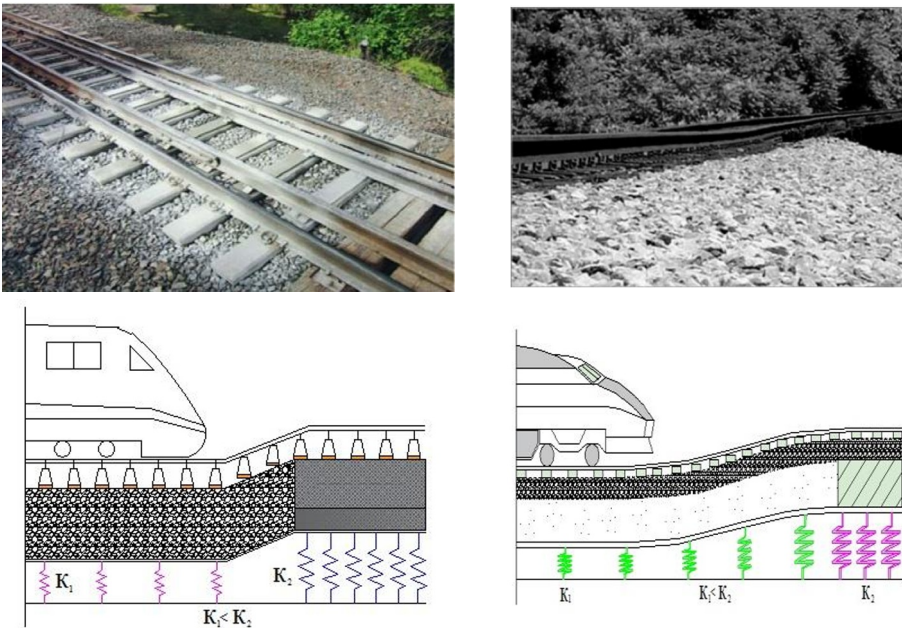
Formation of a bridge pit due to ballast crushing [5]
